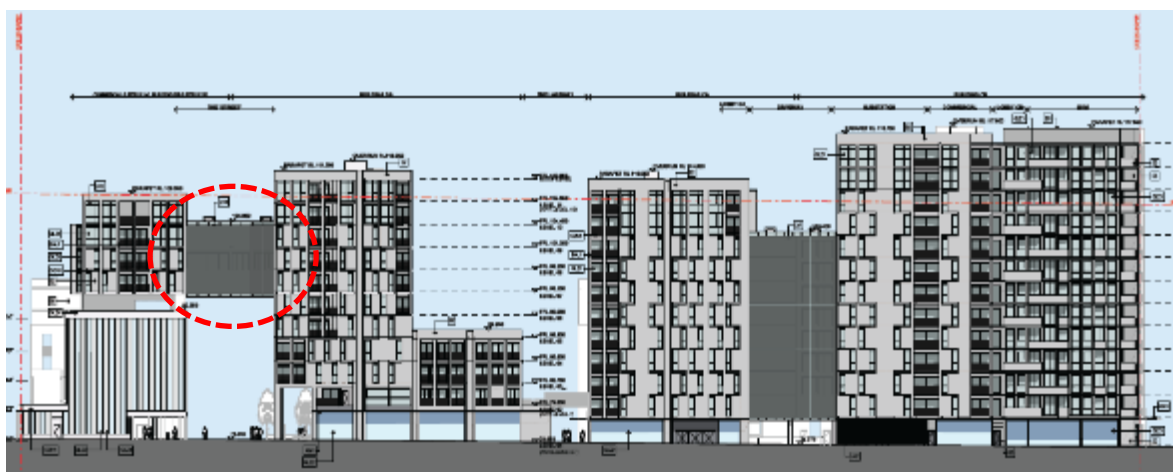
Rutledge Street Elevation (Plan 1502, Revision 1)
